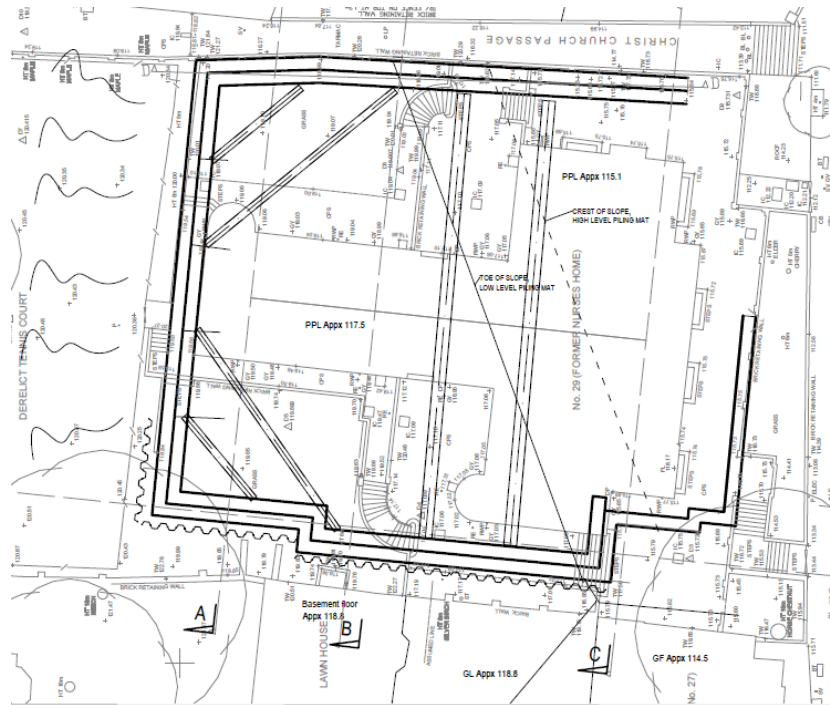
Preliminary arrangement of temporary sheet pile and propping to enable secant pile wall construction.
